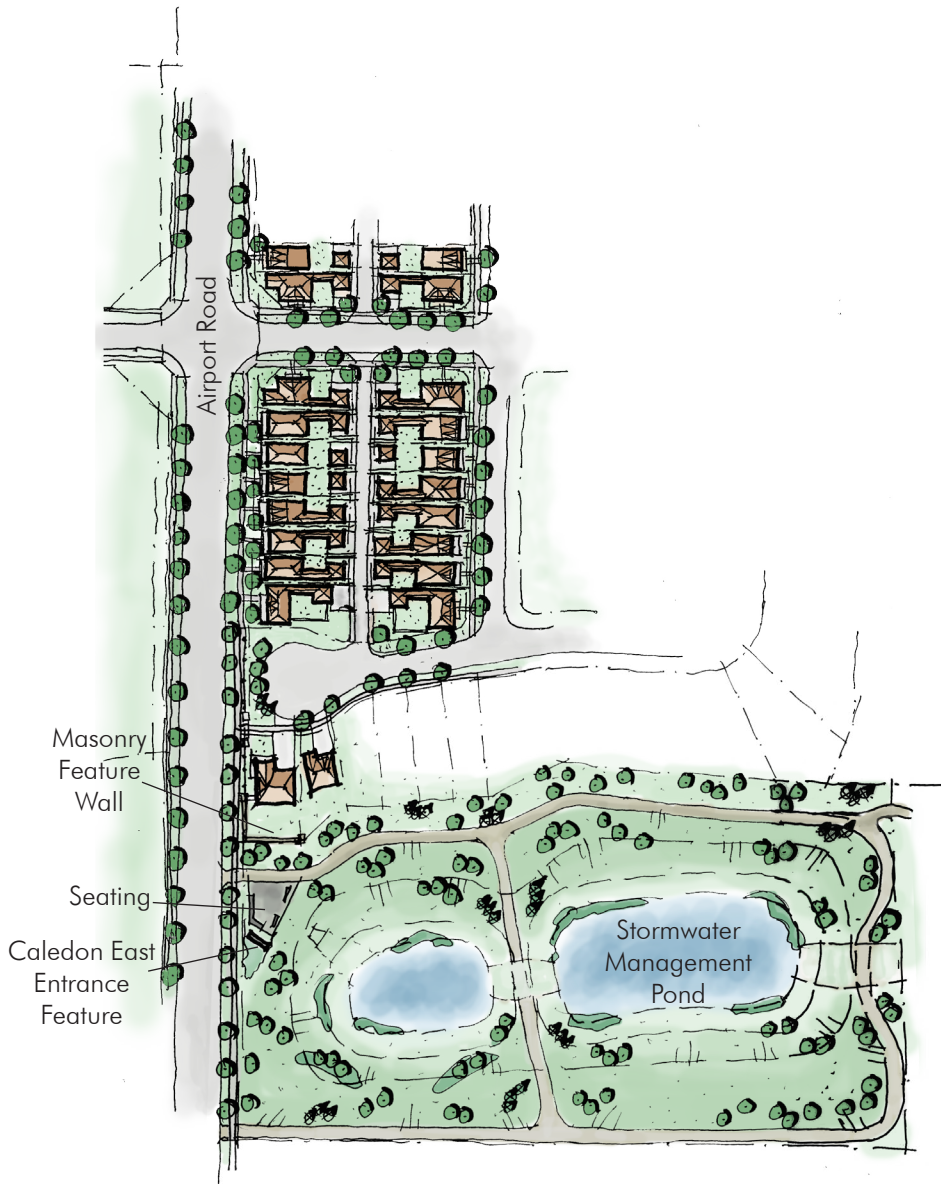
The South Corner of the Proposed Development at Airport Road
